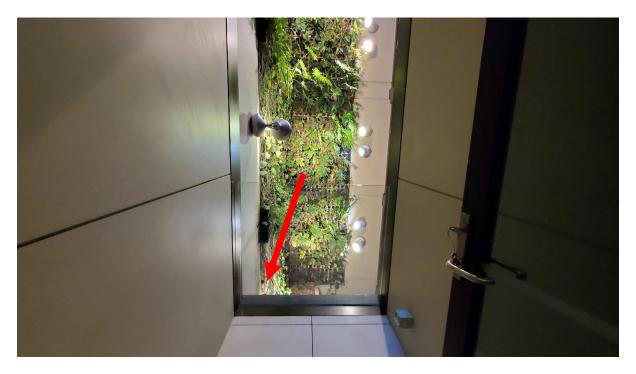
View of level three resident balcony with terrace behind green wall down to the left
